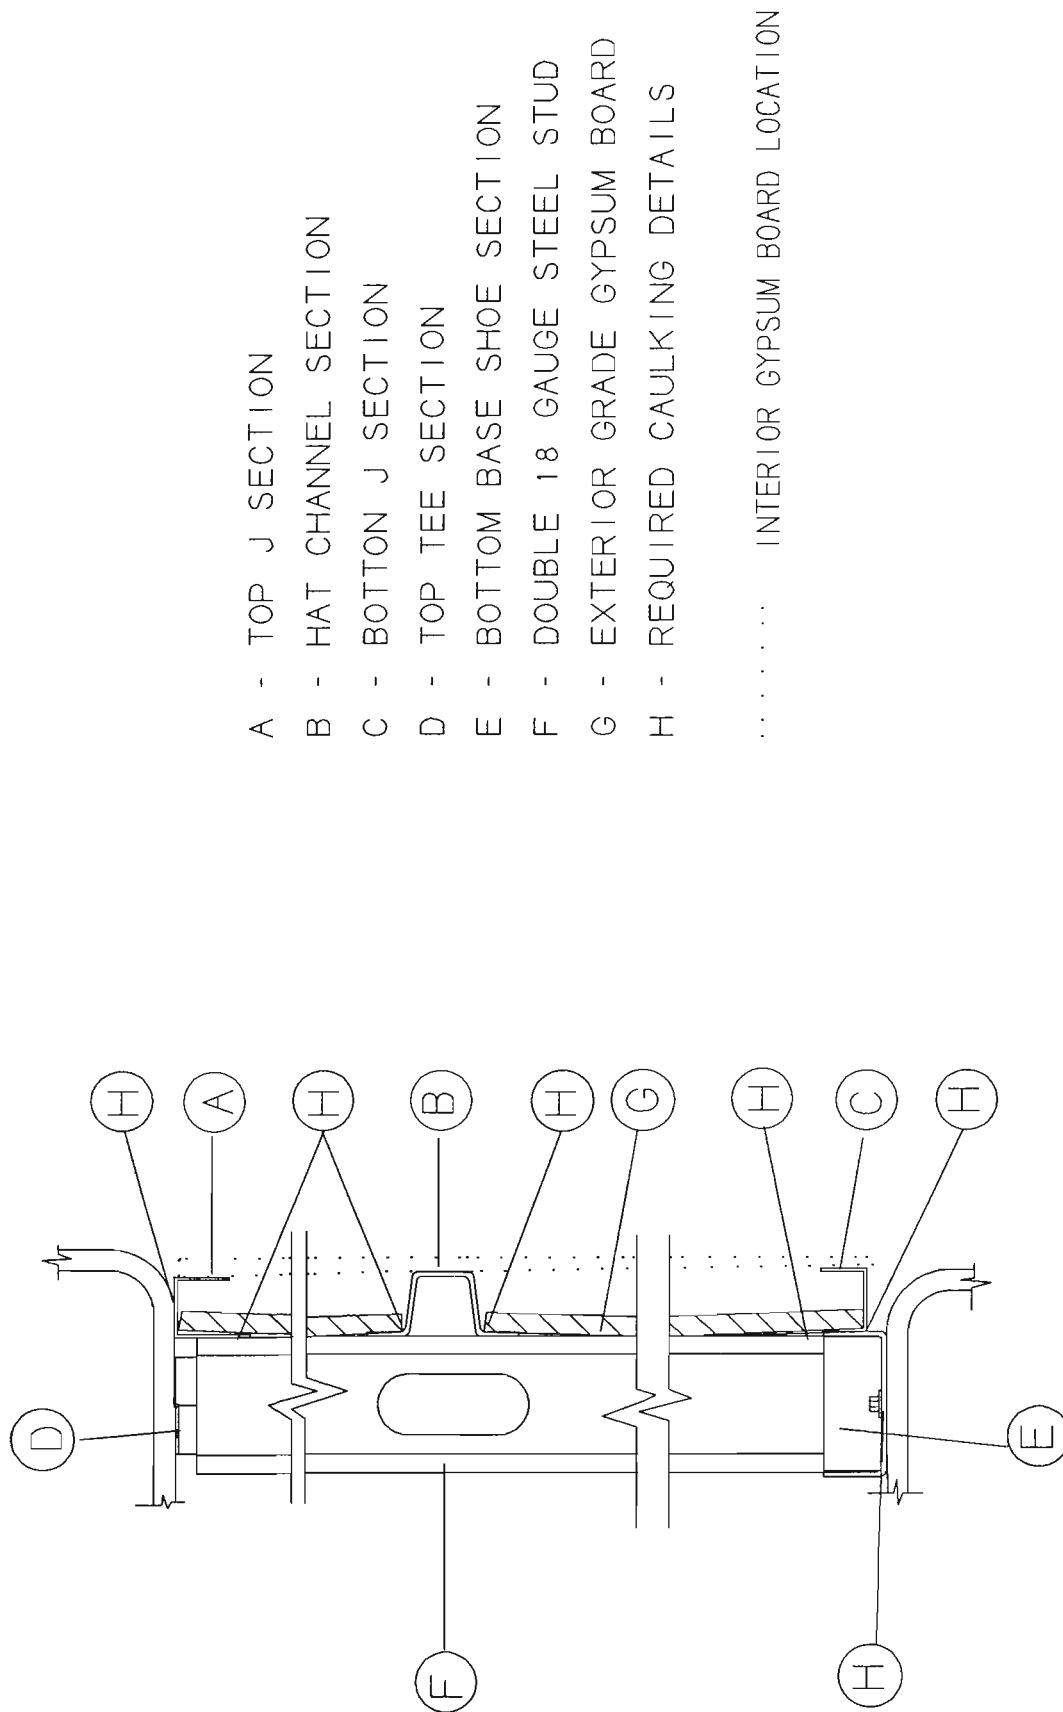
AIR BARRIER DETAILS FOR WALL3
